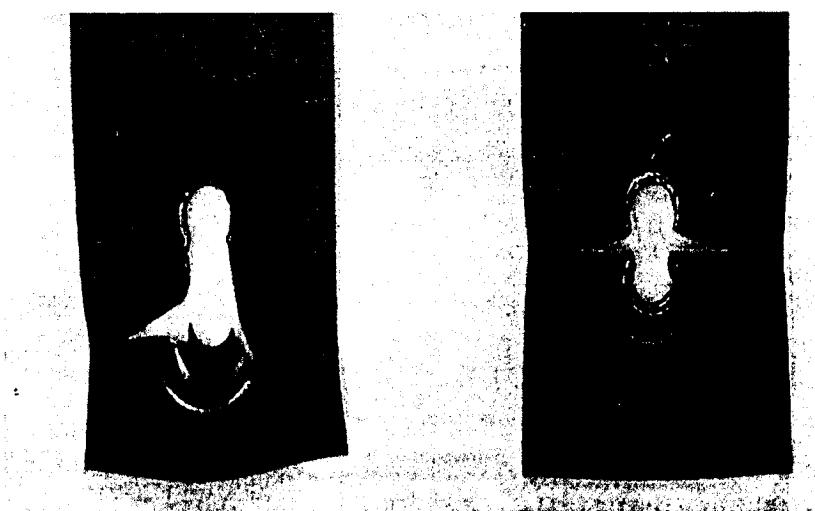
Type C Bearing Failure: 043-230-1/2-DS-A (left) and 043-230-1/2-DS-D (right)
